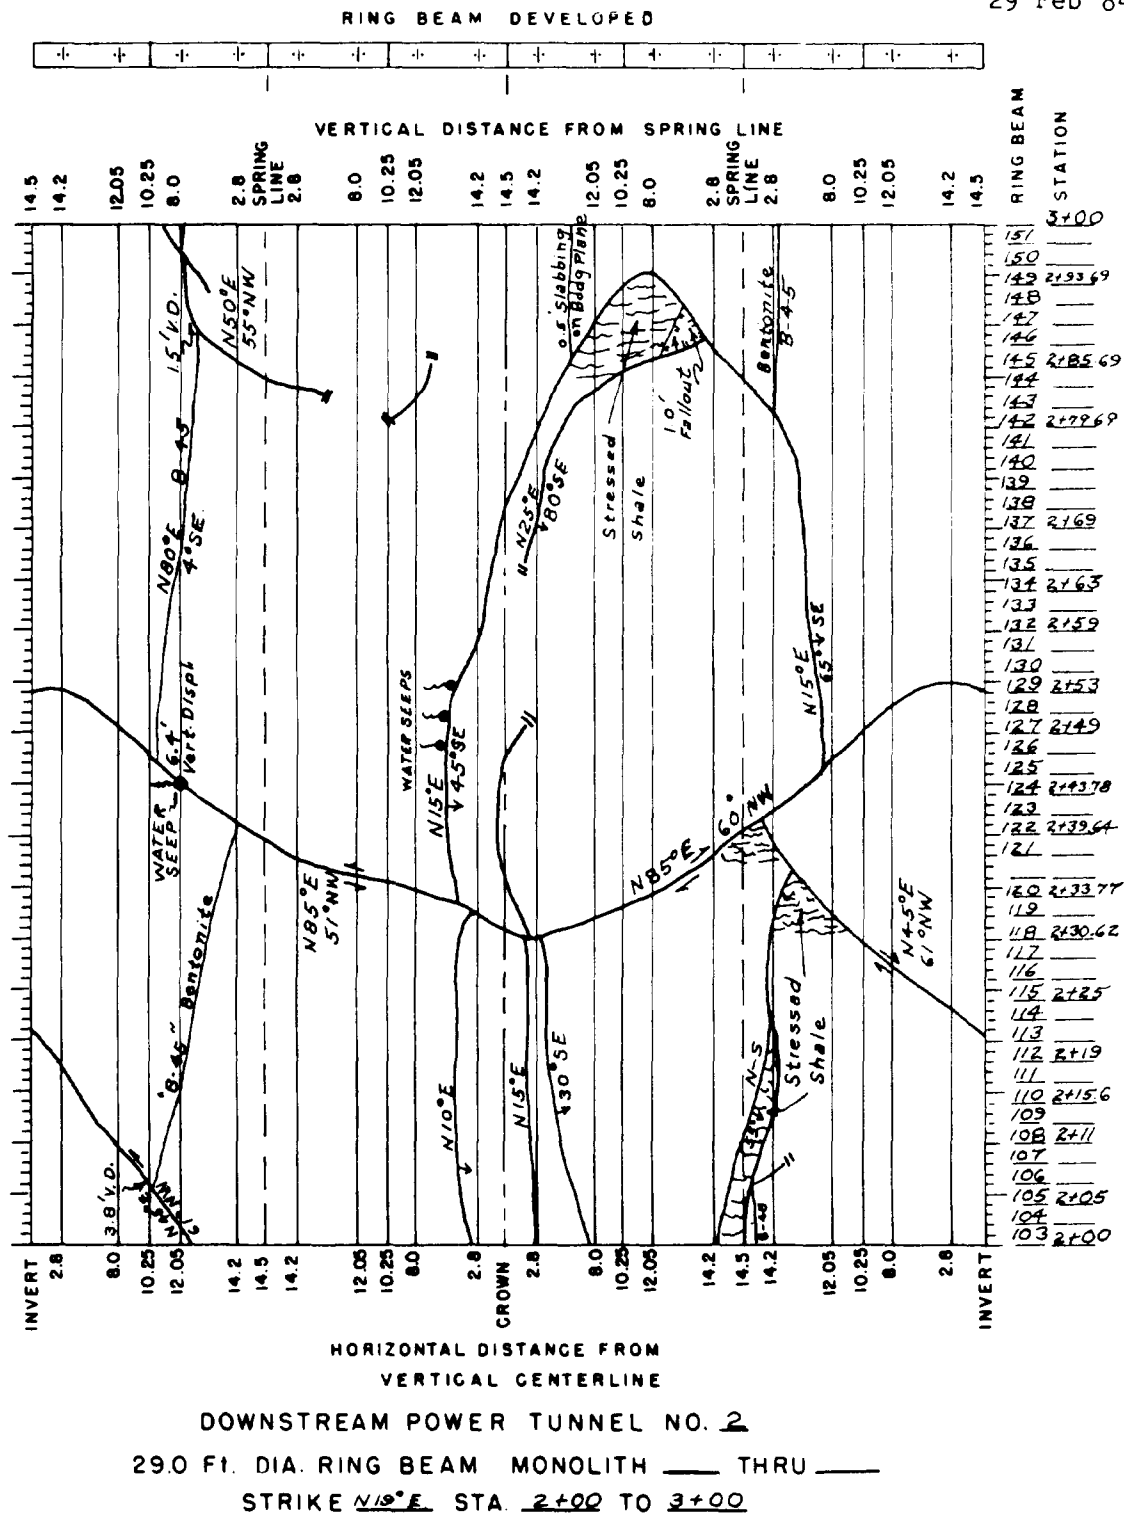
Developed plan of cylindrical tunnel section, Oahe Dam, South Dakota
